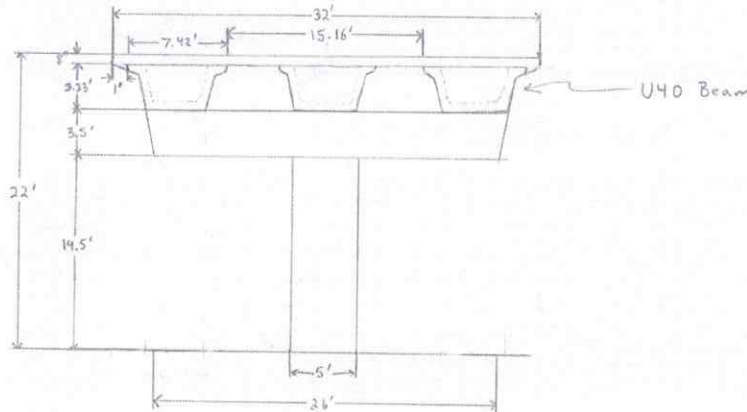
Pier and beam geometry of the TxDOT U-Beam Bridge
